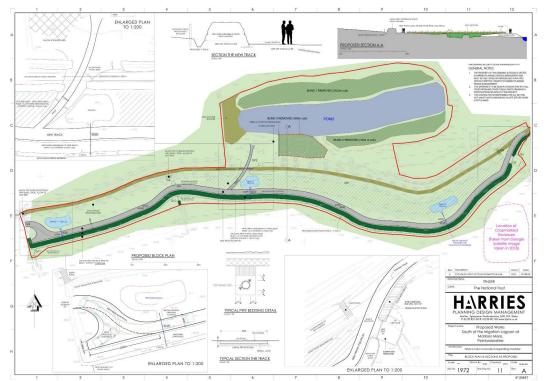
Detailed site and development location plan. Plan provided by the client, not reproduced to original scale.
